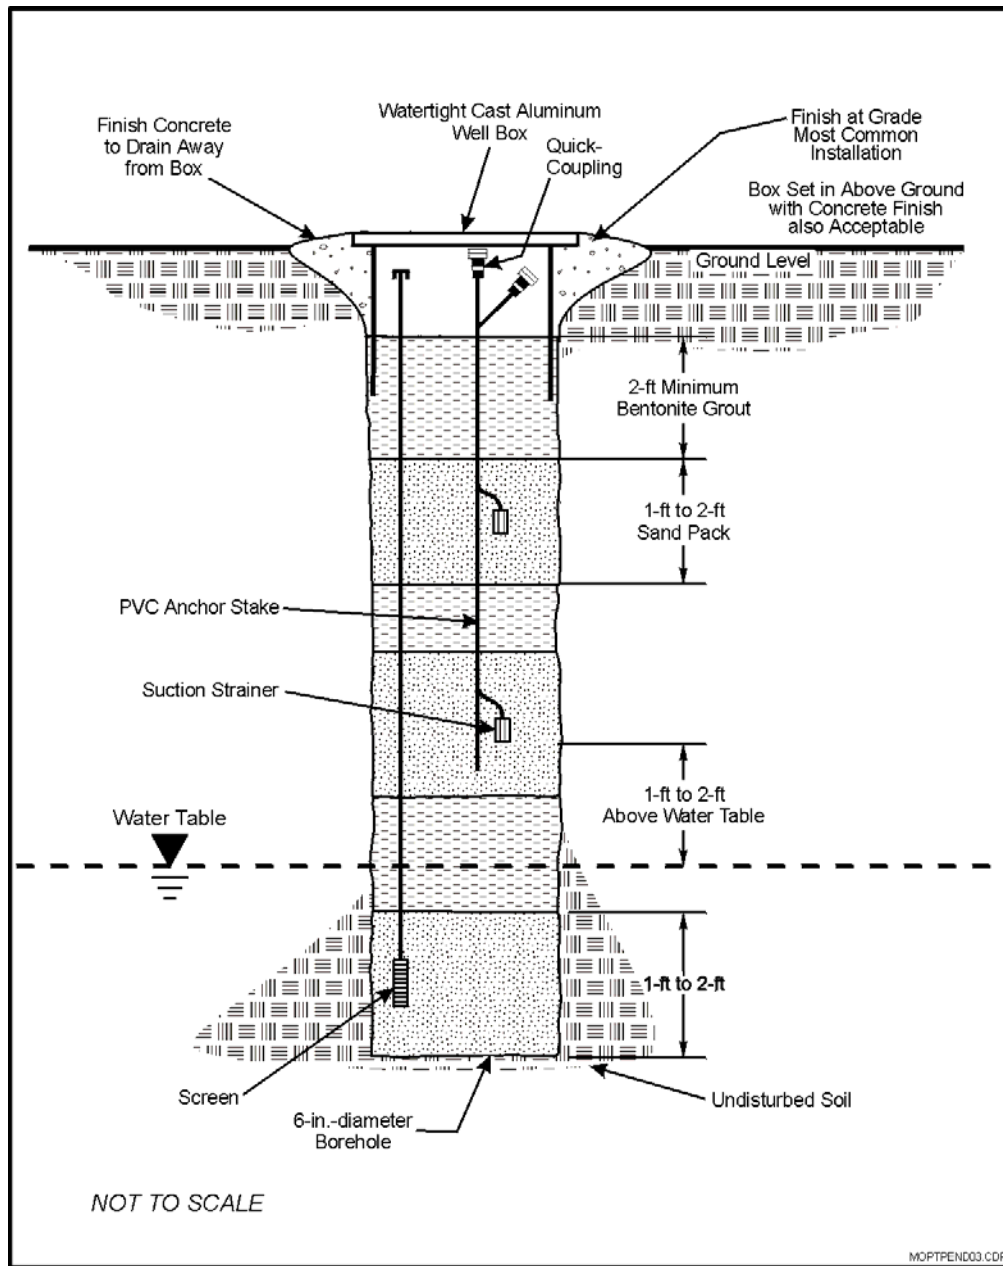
Typical Soil-Vapor/Groundwater Monitoring Point Construction
